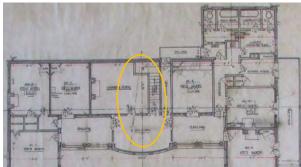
Original first-floor plan showing (circled) the location of the potential staircase and wall modifications.
